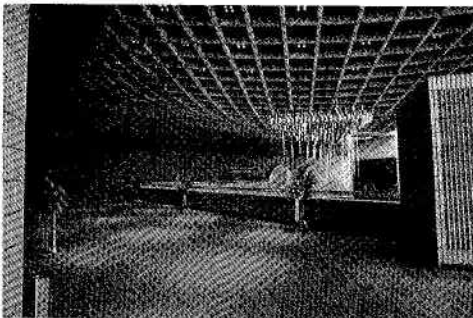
Finished concrete lattice of roof, viewed from cantilevered gallery of foyer
